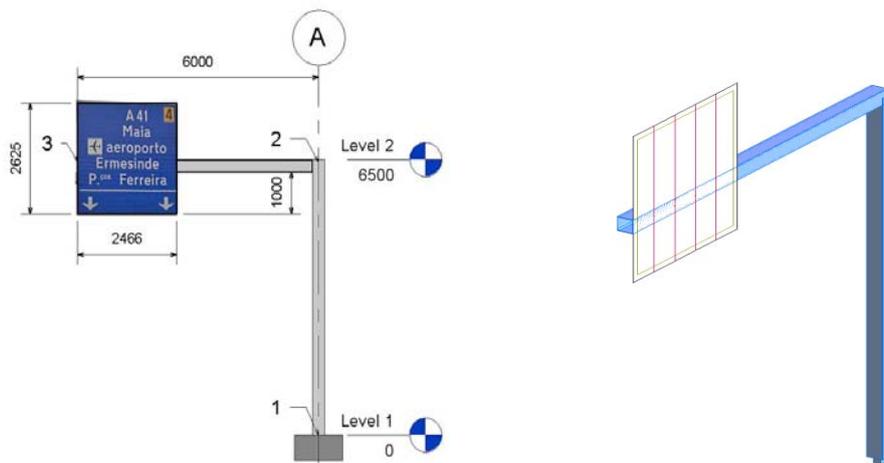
Geometry of the support (dimensions in mm, left) and numerical model of the cantilever sign (right)
